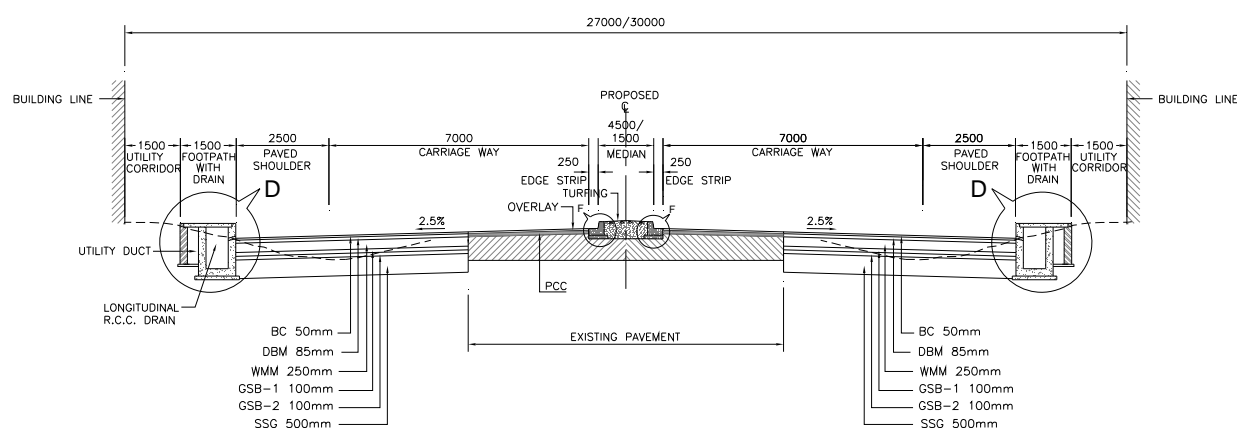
TYPICAL URBAN CROSS SECTION FOR RESTRICTED ROW
